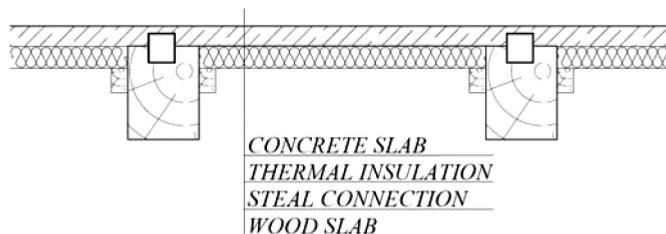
Direct coupling of the wooden ceiling structure with a reinforced concrete slab
